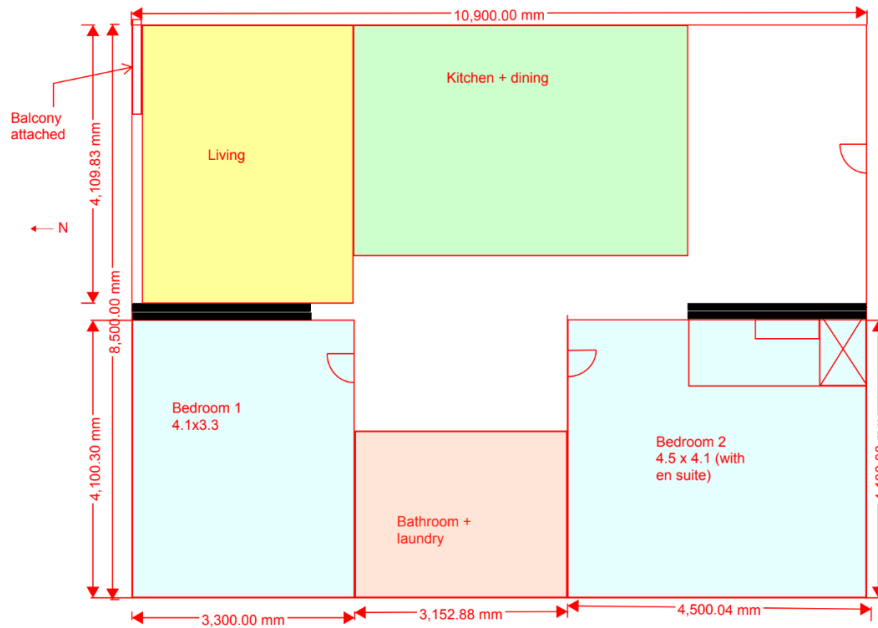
A: Floor plan of a 2-bedroom 2-bathroom apartment unit
